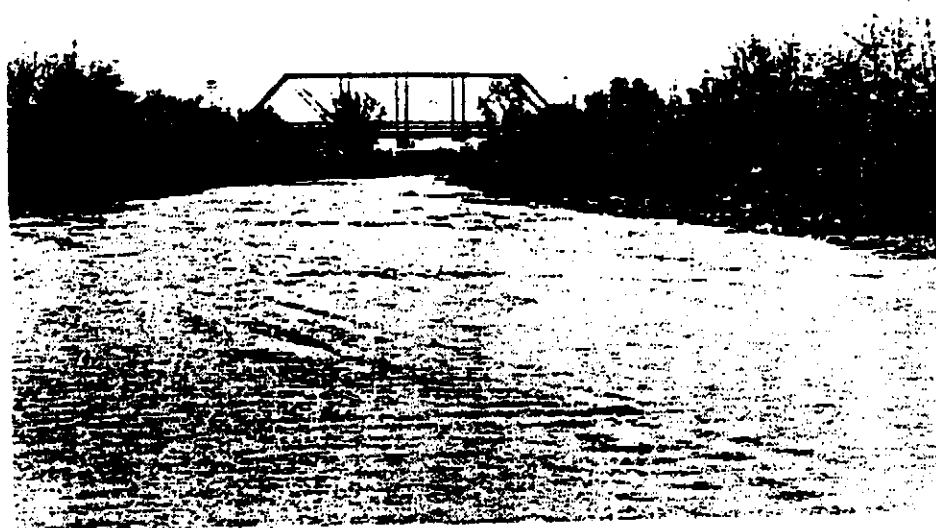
View looking upstream at Congress Street in 1902. The deep arroyo that eroded in 1890 and 1891 made river crossings more difficult. By 1902, a Pratt Truss steel bridge had been erected to span the river at Congress Street. This photograph shows a young stand of willows and cottonwoods that were probably established after the 1890 flood (Arizona Historical Society, Tucson, Negative No. 26698).
